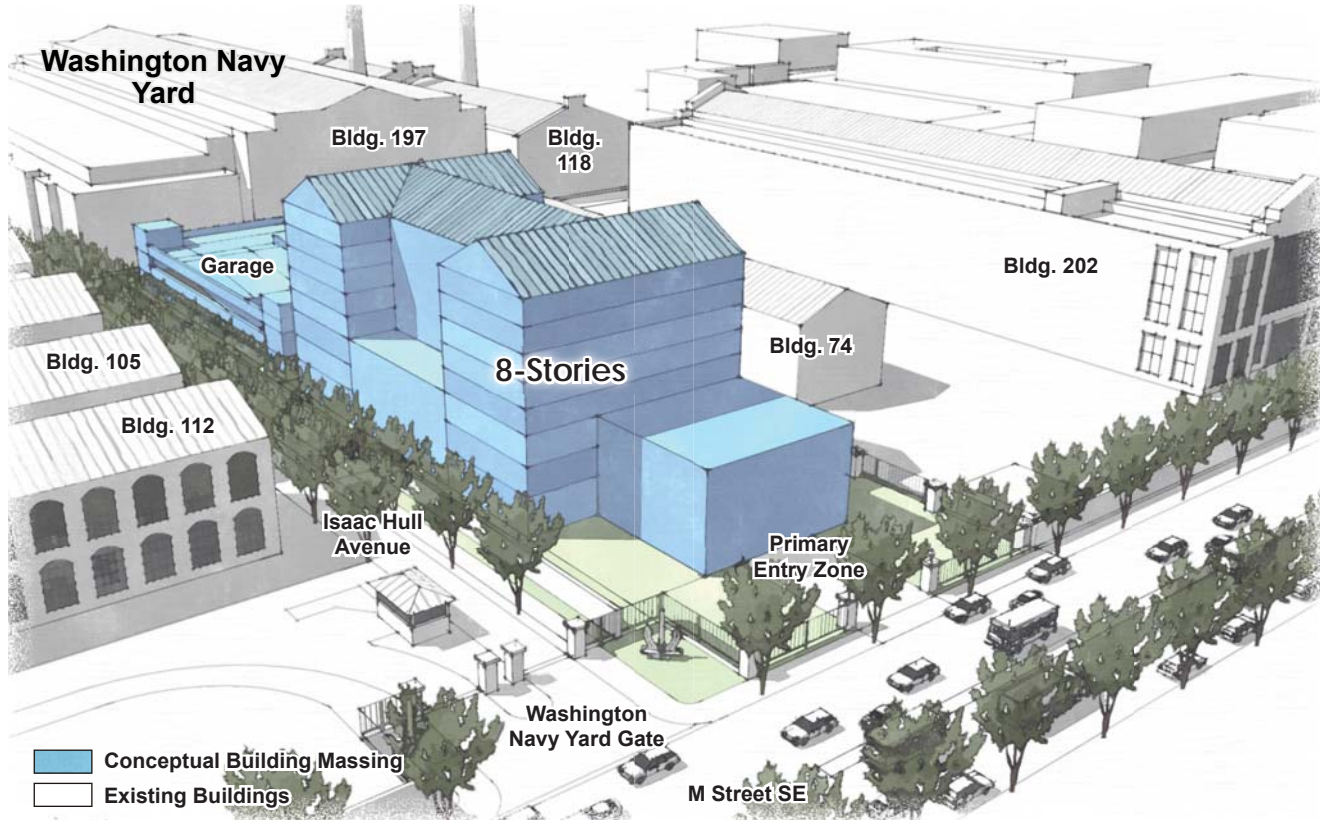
Alternative 3 Site C, Proposed Design Concept
